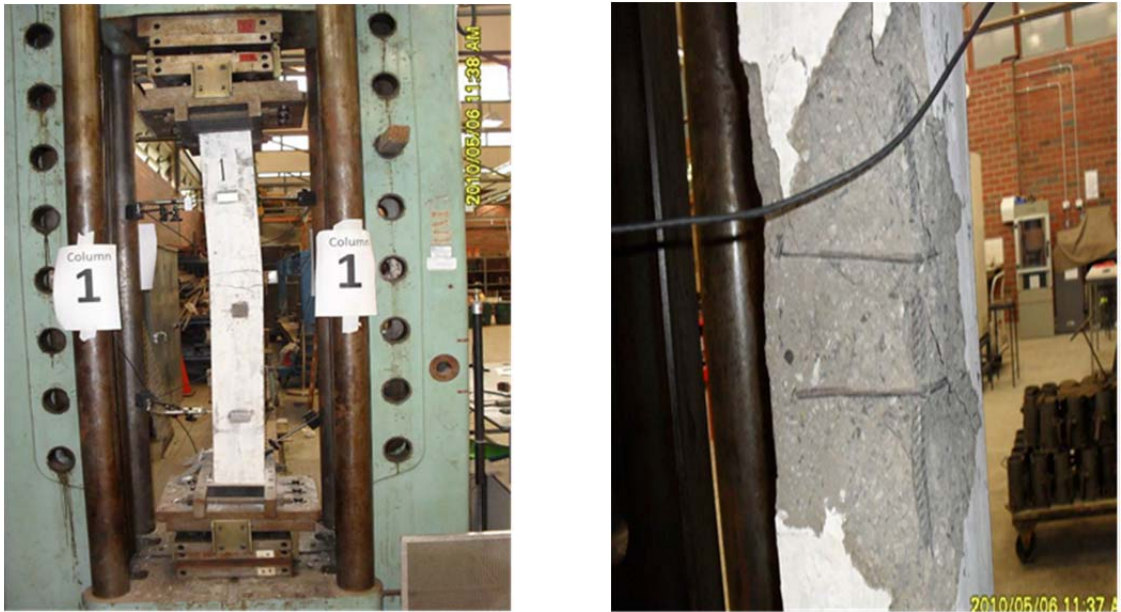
Failure mode of column GCI-C1: (a) column after failure; (b) closer view of failure section
